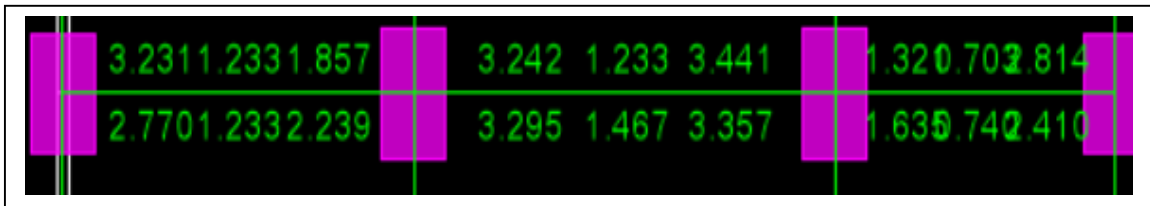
Steel Area of 3rd Floor Beam Y-axis
